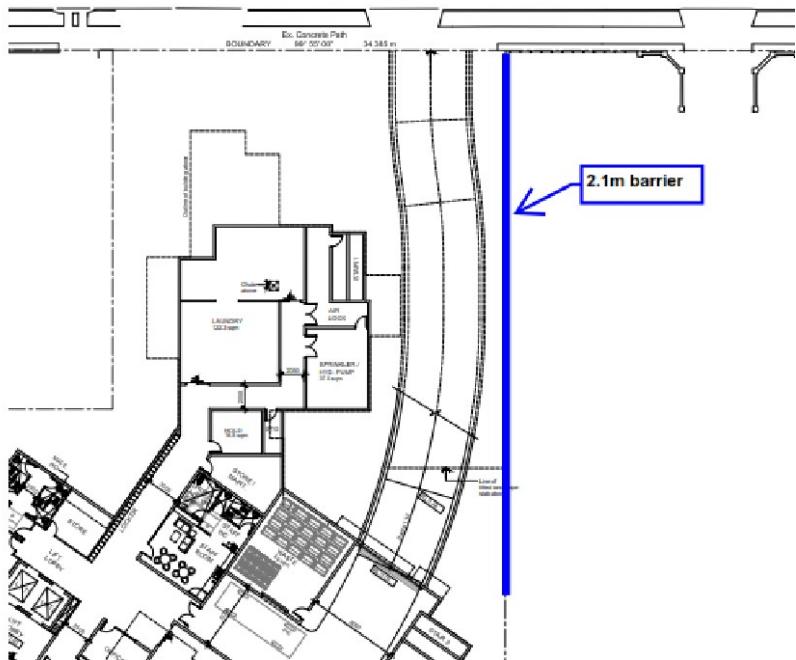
Proposed 2.1m barrier to minimise noise impacts to villas at No. 121 Barton Street.
